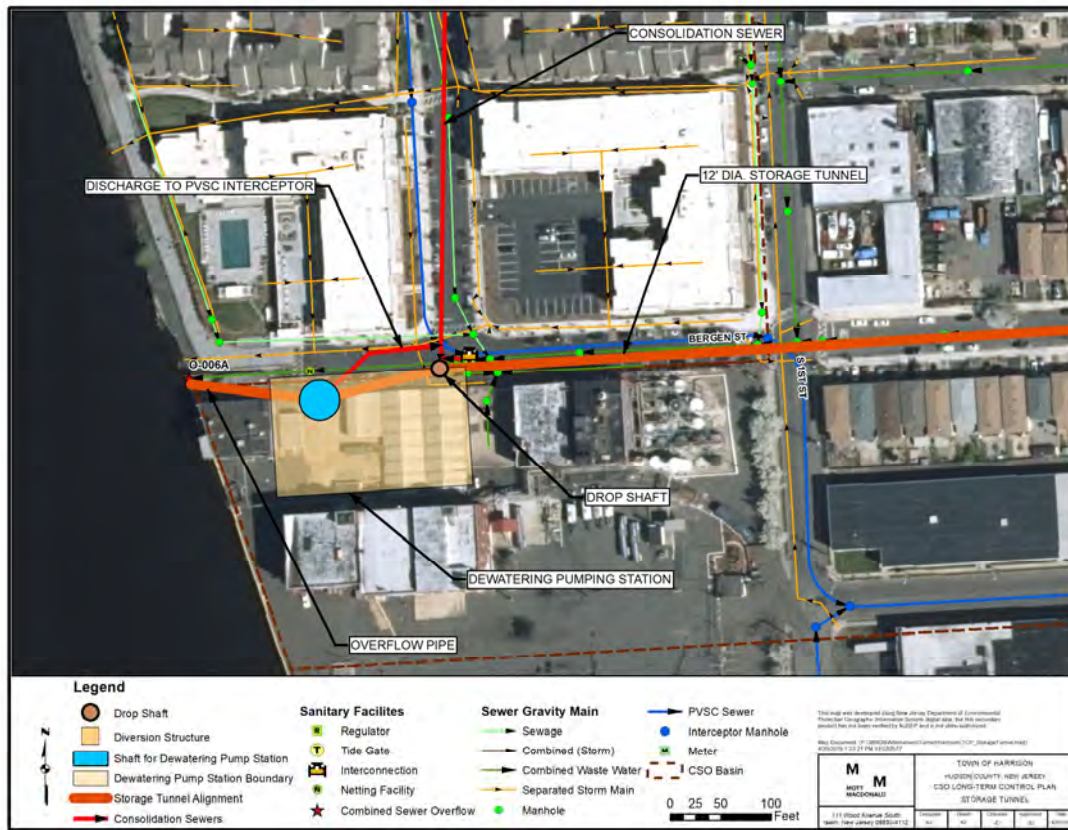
Tunnel Storage Conceptual Dewatering Layout
